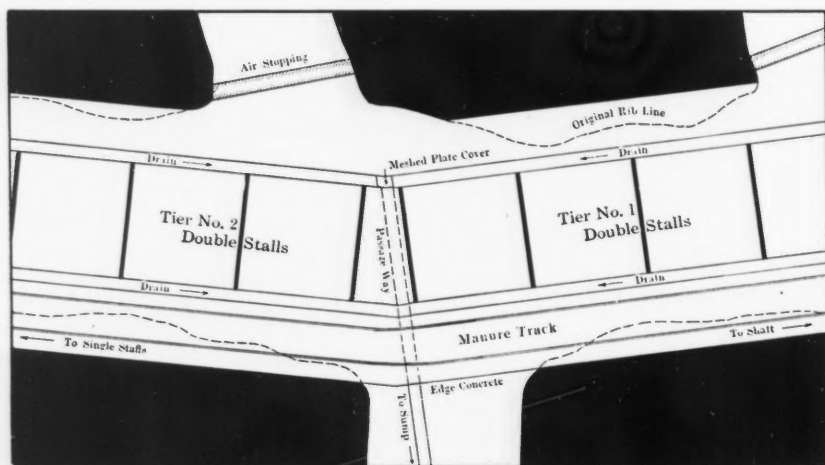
PLAN OF STALLS AND MANURE TRACK
